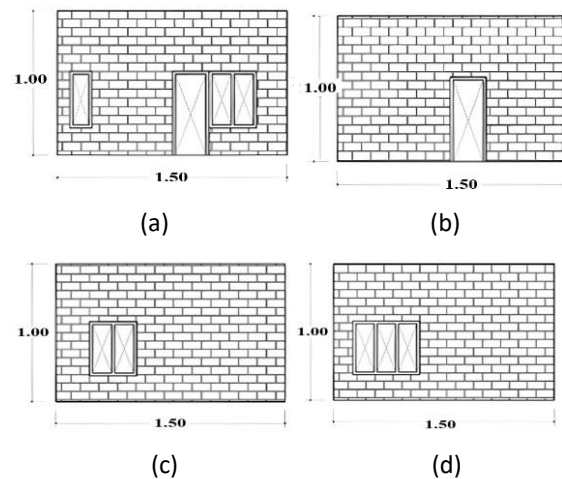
Elevation view of specimen OH; a) Front view, b) Back view, c) Left side view, and d) Right side view
